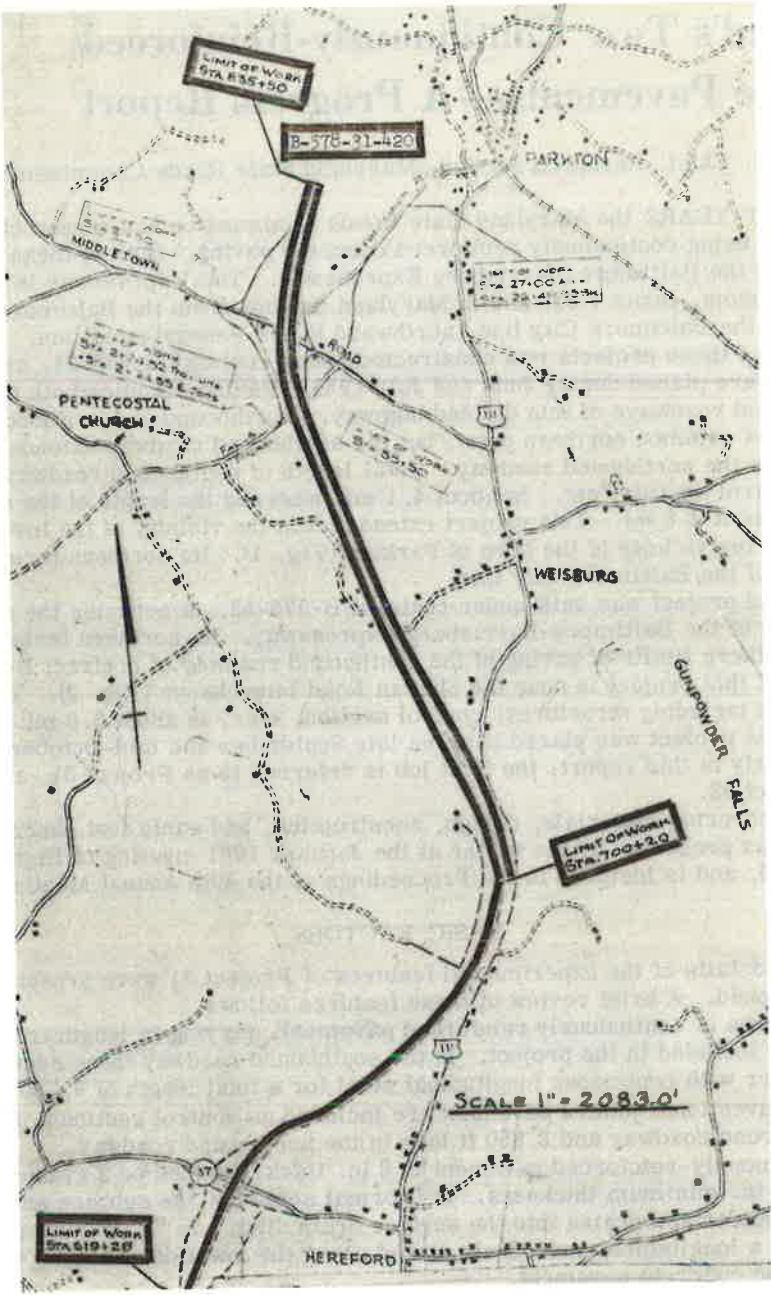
General location of experimental continuously-reinforced concrete pavement, Project 31.
